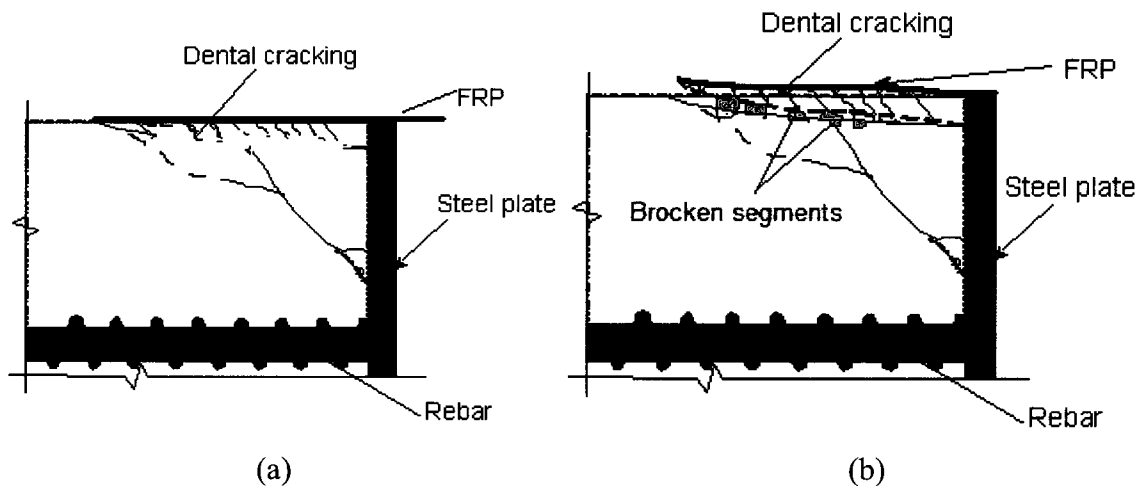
Cracking pattern of the Series 2 specimens with pushing setup (a) Configuration of the diagonal and cantilever column cracking (b) After first stage of failure, secondary support of pushing steel plate and substituting broken segments
